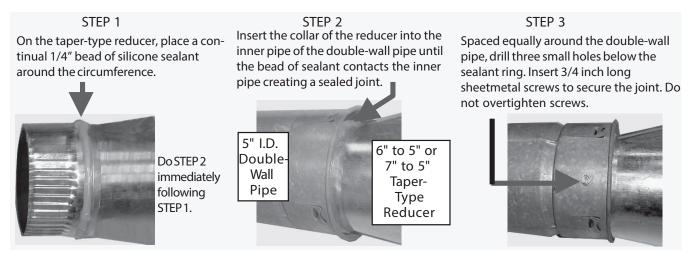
Joining Double-Wall (Type B) Pipe to Single-Wall or Category III Vent Pipe Using Tapered Reducer
